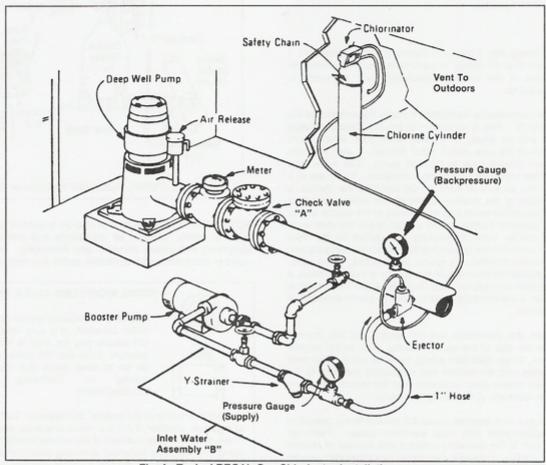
Typical REGAL Gas Chlorinator Installation.
